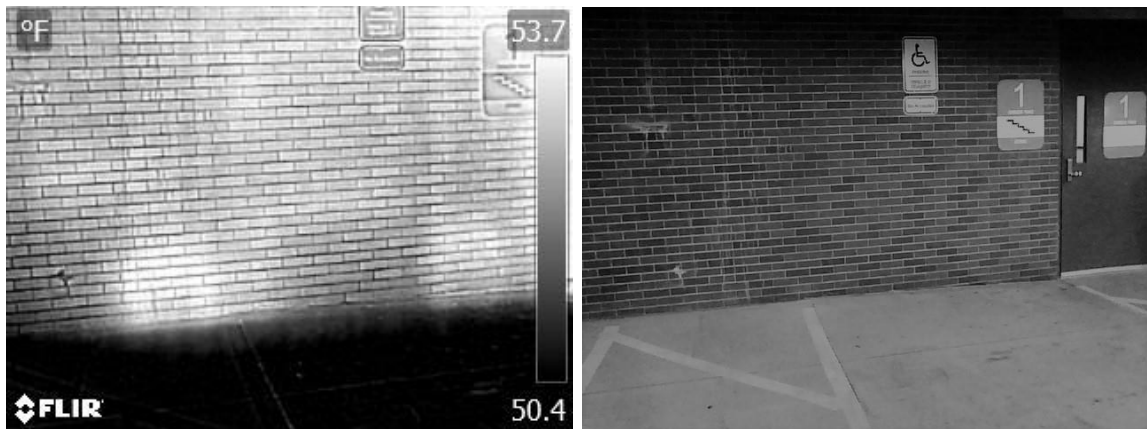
Heat transfer through thermal bridge at base of wall (exterior of stairwell)
